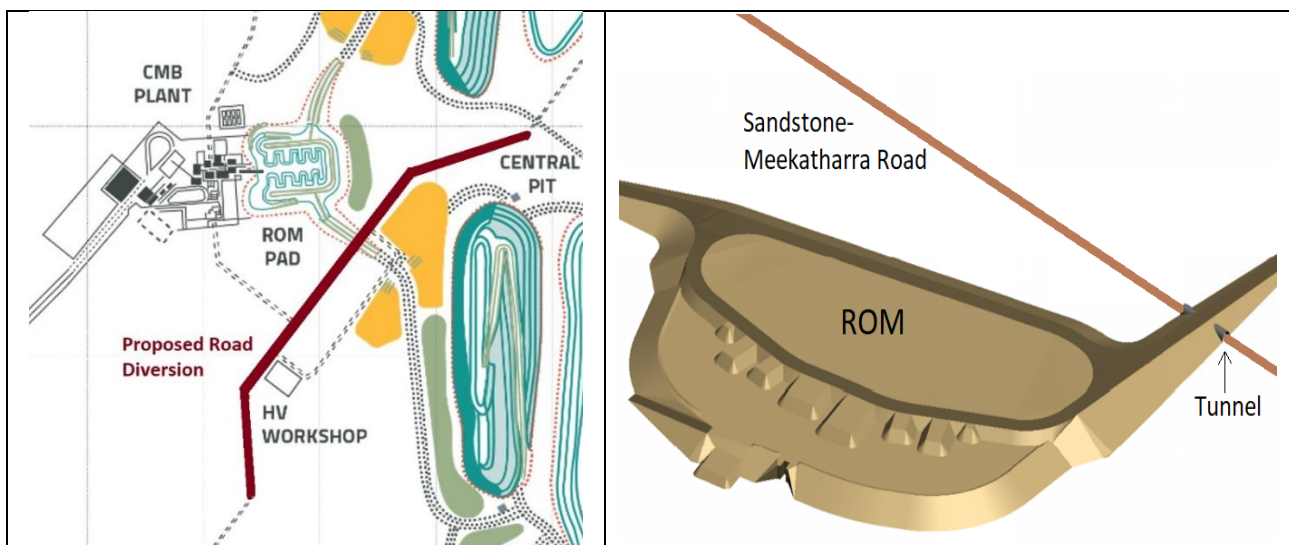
Proposed Sandstone-Meekatharra Road diversion and overpass
